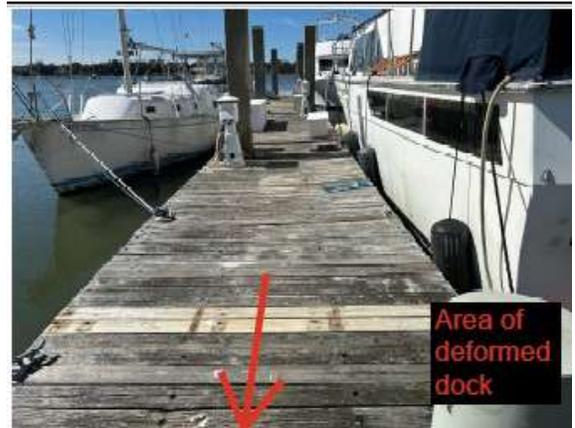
Site 3: D dock at A-G dock - damaged mech connectors caused deformation and instability of dock
